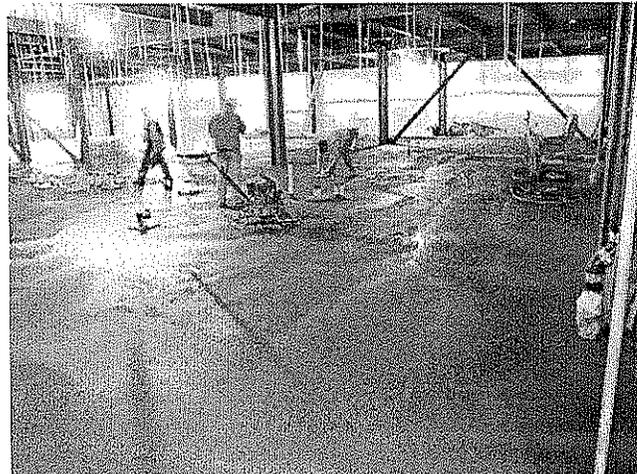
View southeast on the 1st floor of building segment C, afternoon, February 18, 2011.
